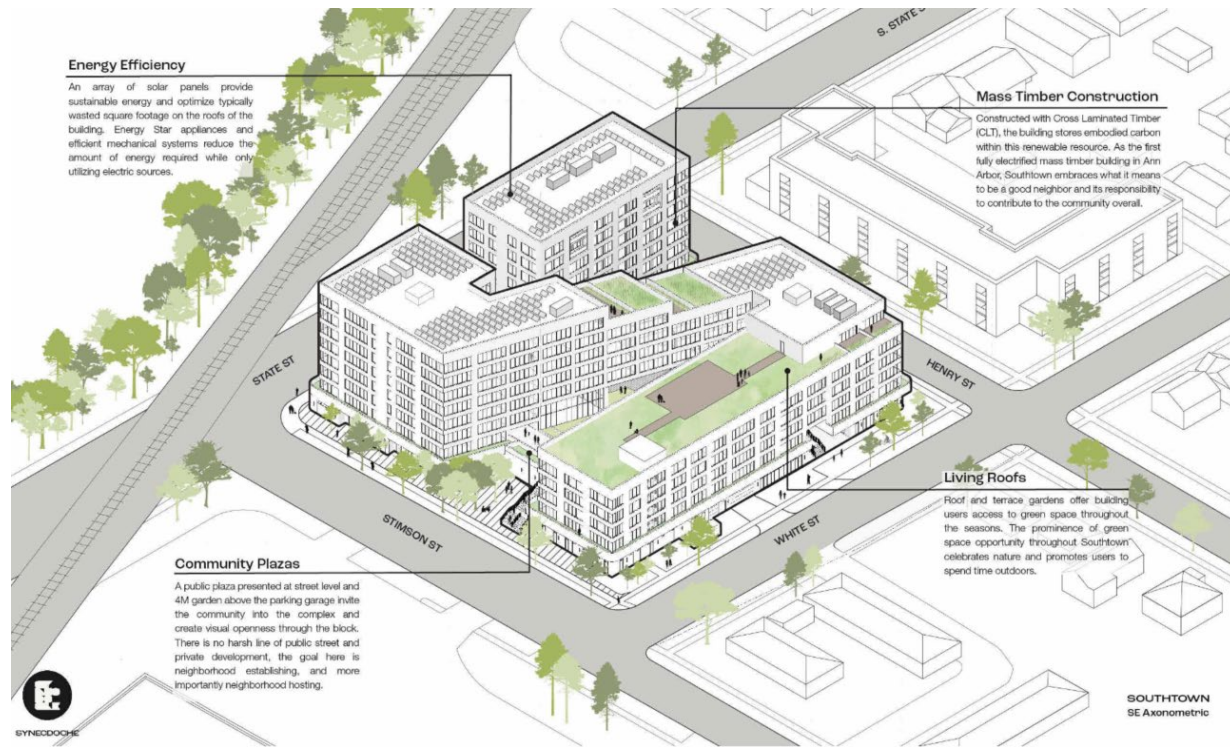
Axonometric Site Layout (from Stimpson/White corner looking NW)
